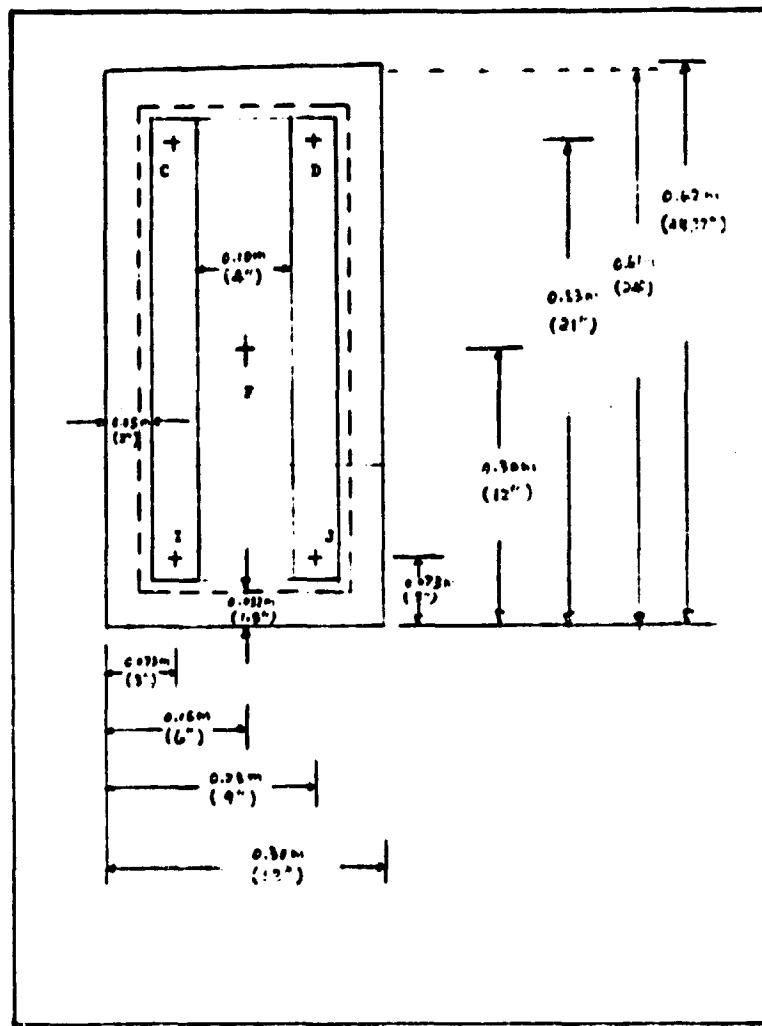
MEASUREMENT LOCATION FOR SPECIMENS 37-A AND 37-B
